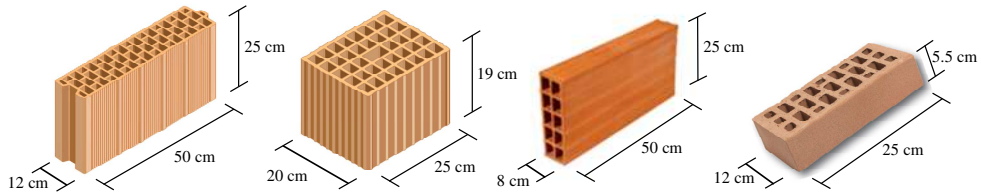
Bricks used for the infill masonry walls in Building 1.
